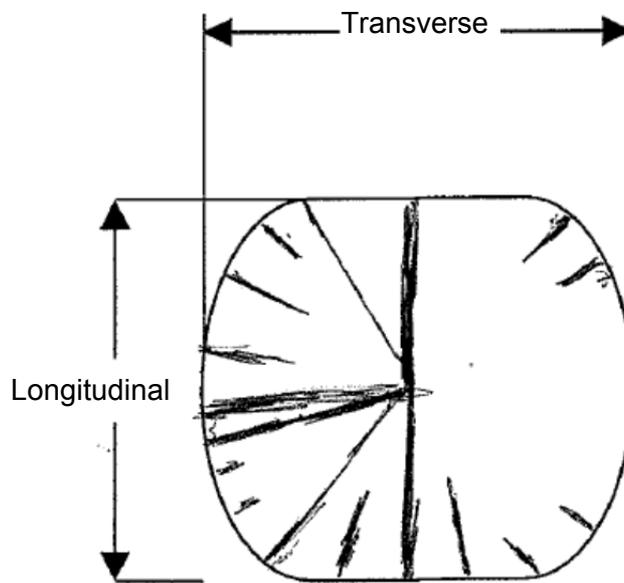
PILE SECTION DIAGRAM EXAMPLE
